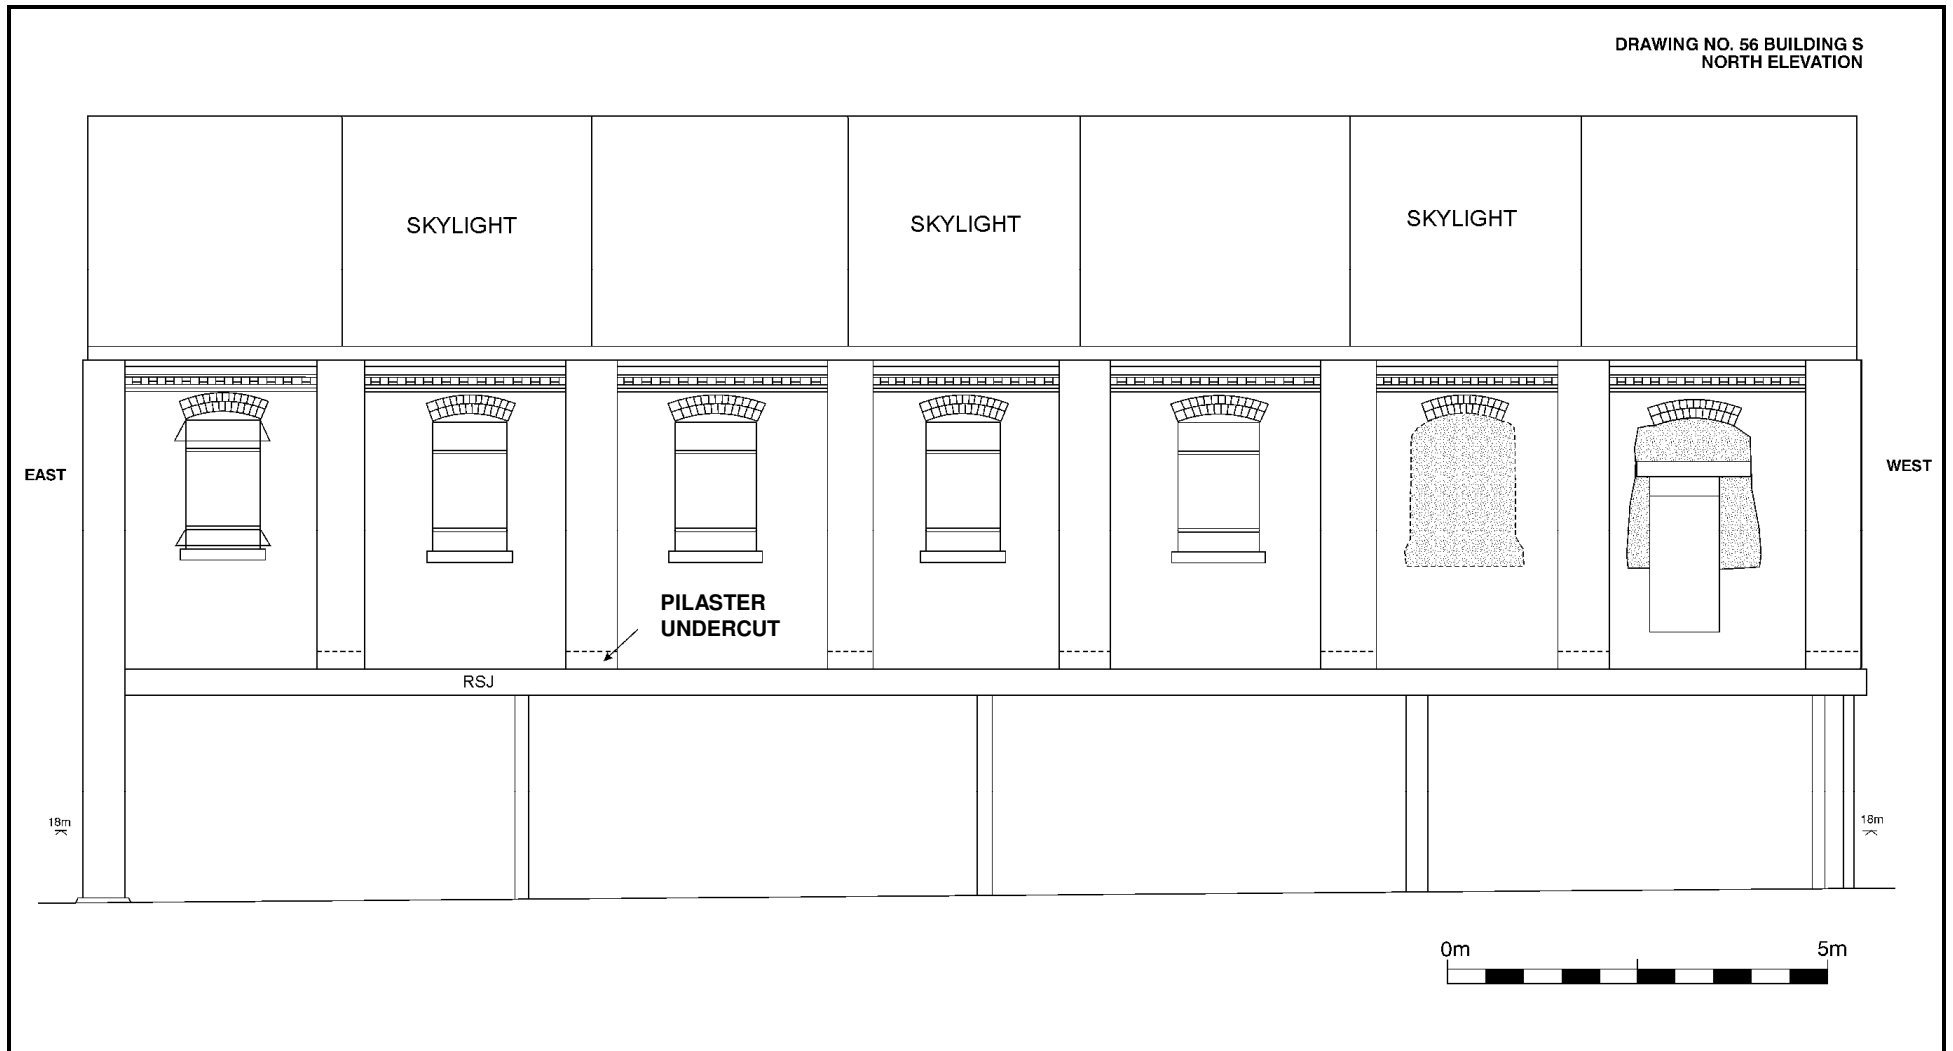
Survey drawing of the north elevation of Building S (scale 1:100)
